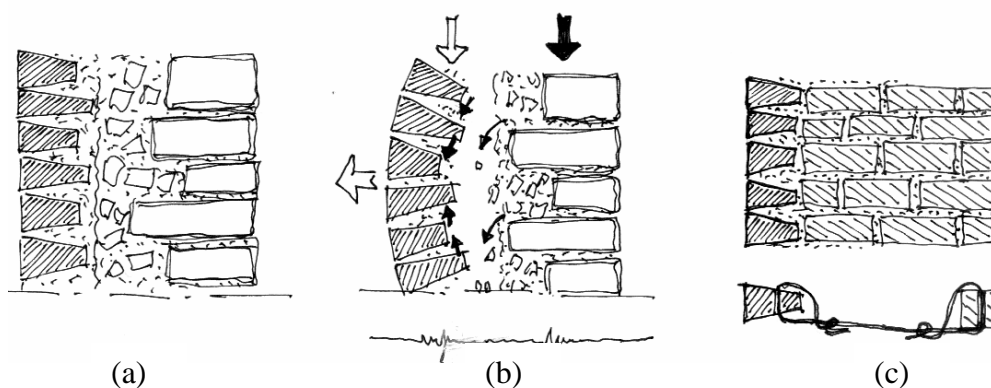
Traditional design of wall layers: (a) wall layers before loading, (b) bulge between wall layers, and (c) tying the wall layers using strips (Nienhuys 2003).
